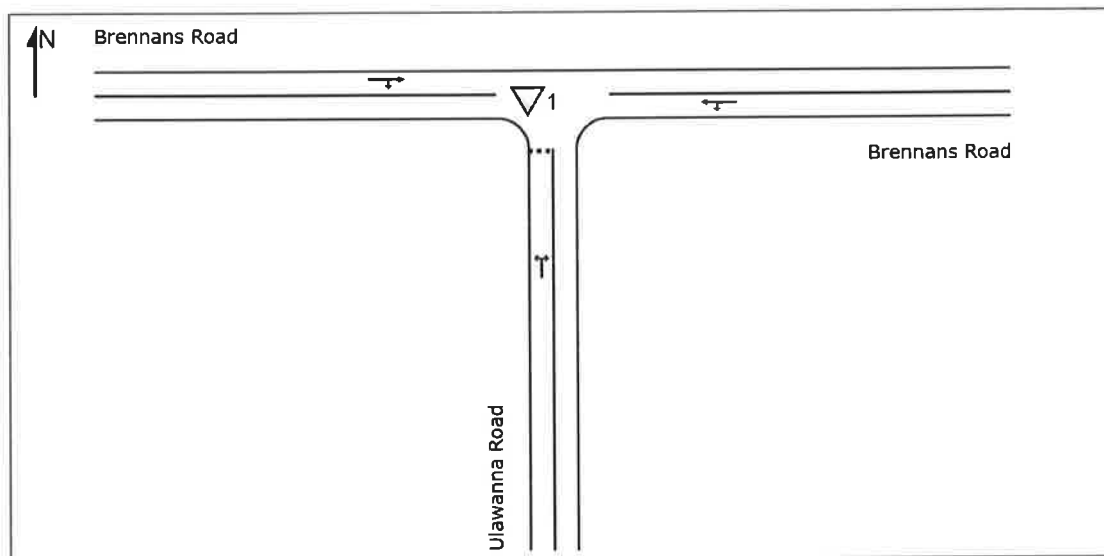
Brennans Road / Ulawanna Road Intersection Layout
